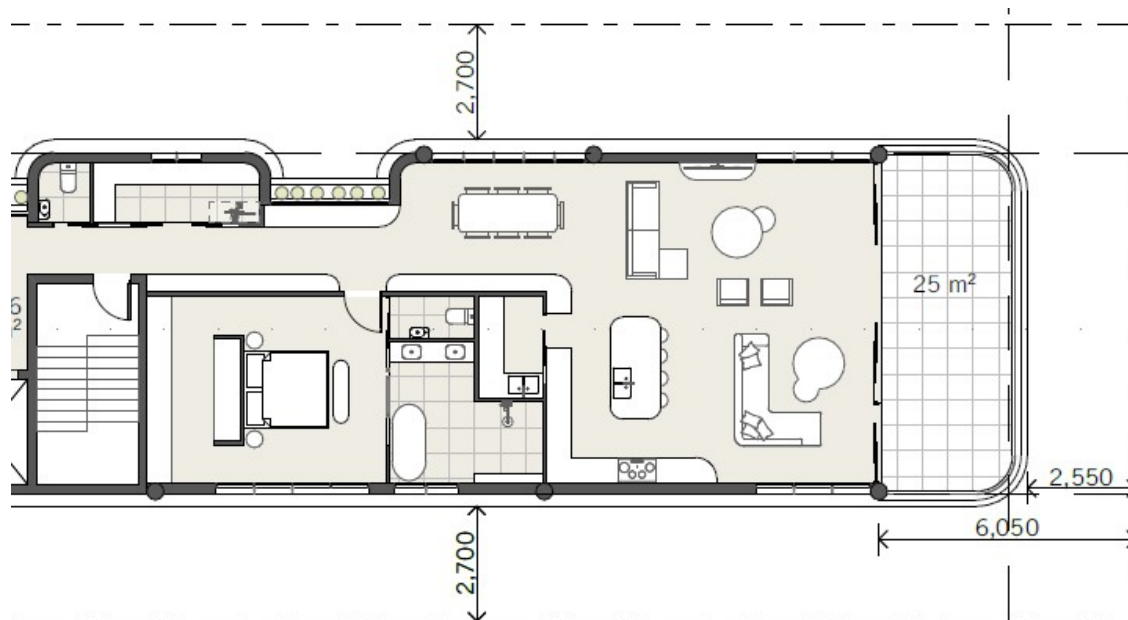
Partial level 3 – 6 floor plan (Source: Lightwave Architecture)
